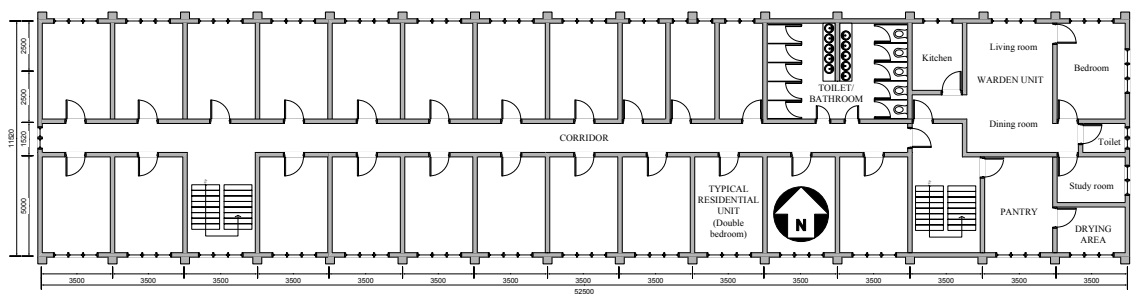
Floor plan of 2nd RC (new additional residential block - Block E)
